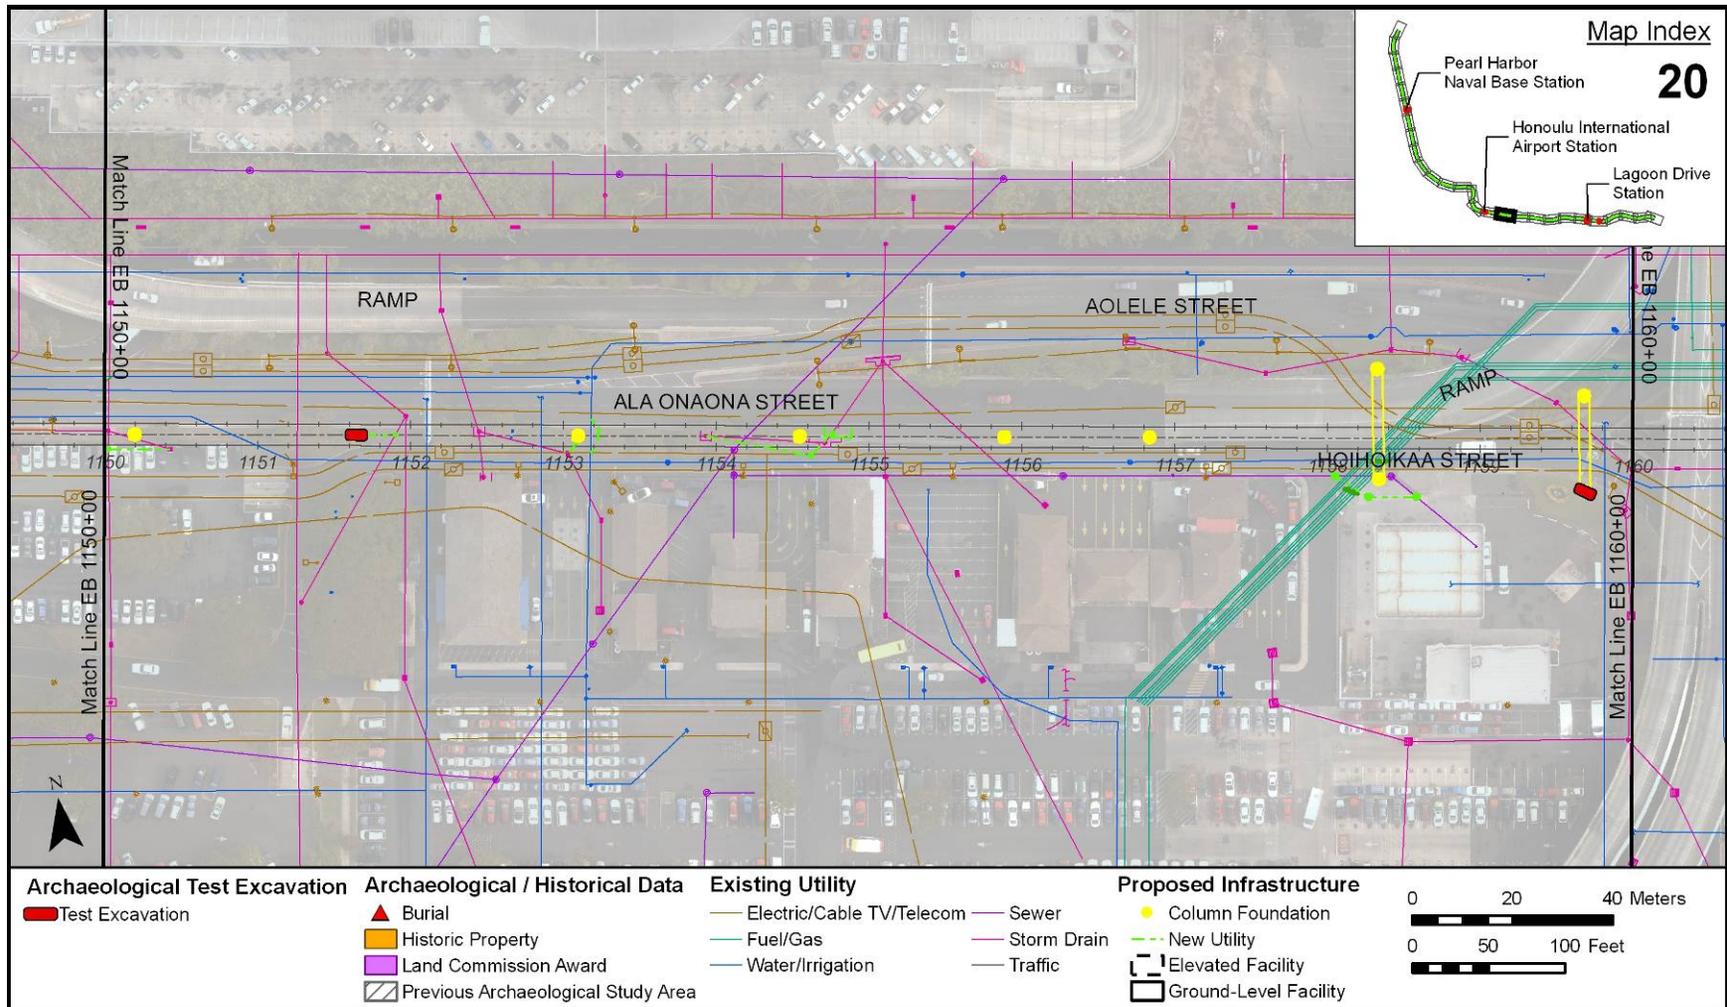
Map Sheet J 20, two 10x3 column foundation excavations @ 1151+60 & 1159+ 70 (*makai*)
